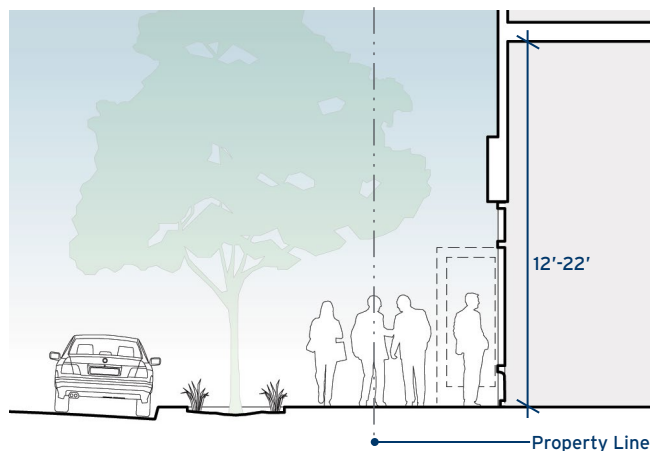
Shopfronts in Mixed-Use Buildings Illustrative Section
